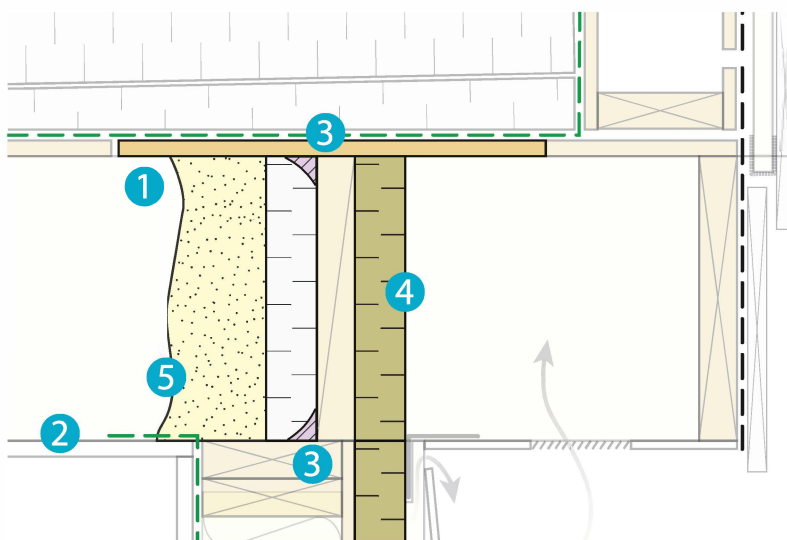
Example Retrofit Strategy for the Roof Exterior to Wall Interior Air Barrier Transition
